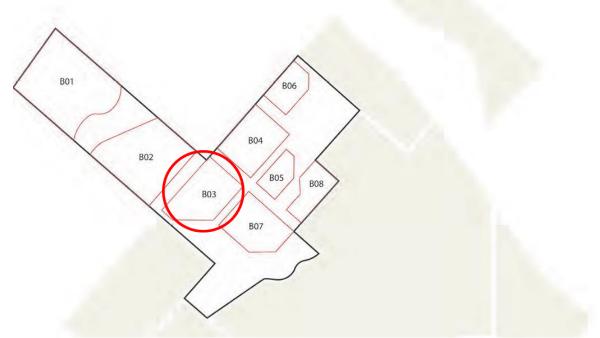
MQU Concept Plan Precinct B Lots (Cox)
